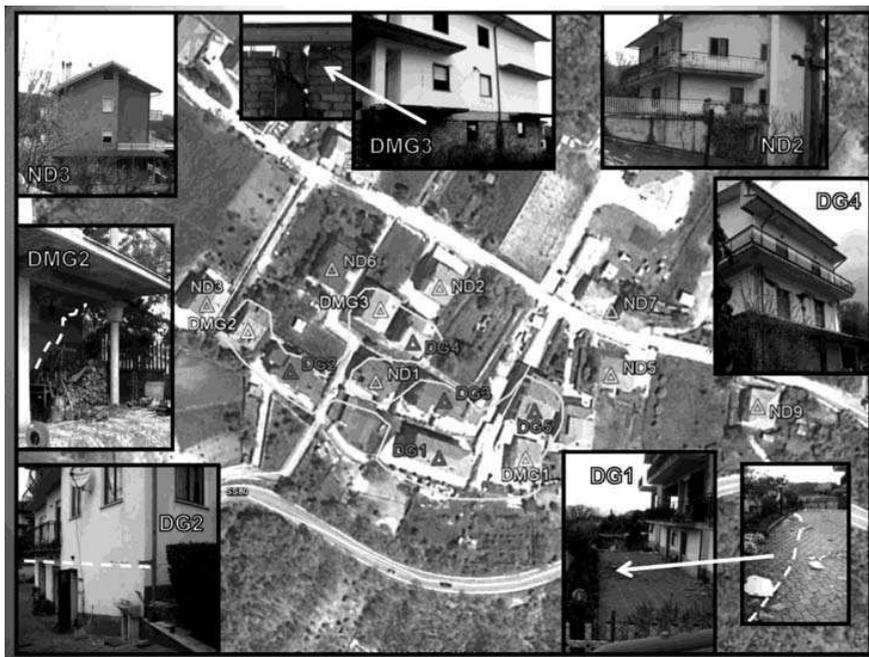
Distribution of structural damages in the area of Macindole (light gray). Legend: DG – buildings with severe damages; DMG – buildings with middle-severe damages; ND – buildings without damages (or with slight damage to single architectural elements).
